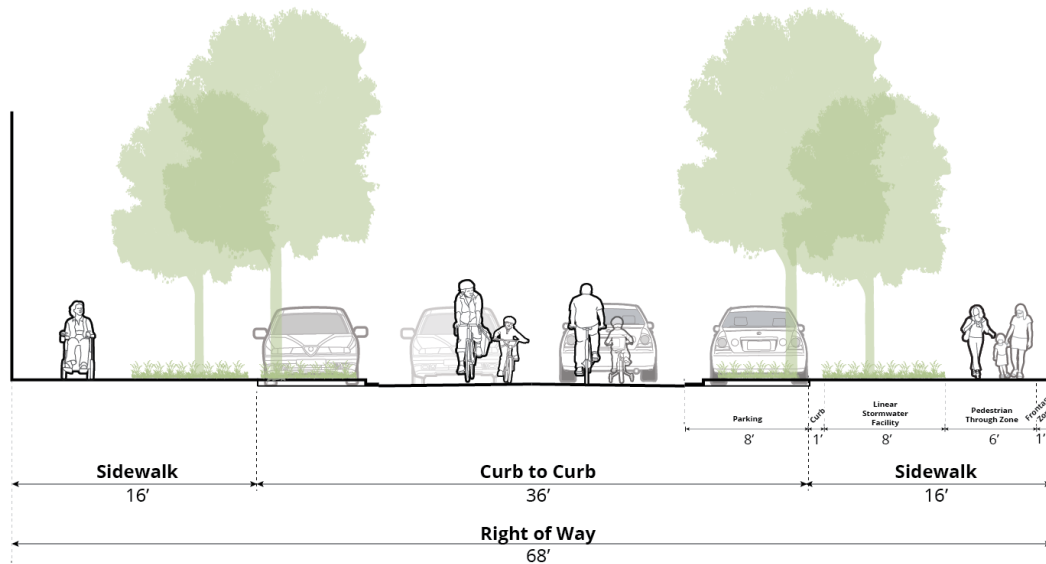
68' Right-of-Way – Local Service Street with Stormwater Facilities and 2 Parking Lanes
